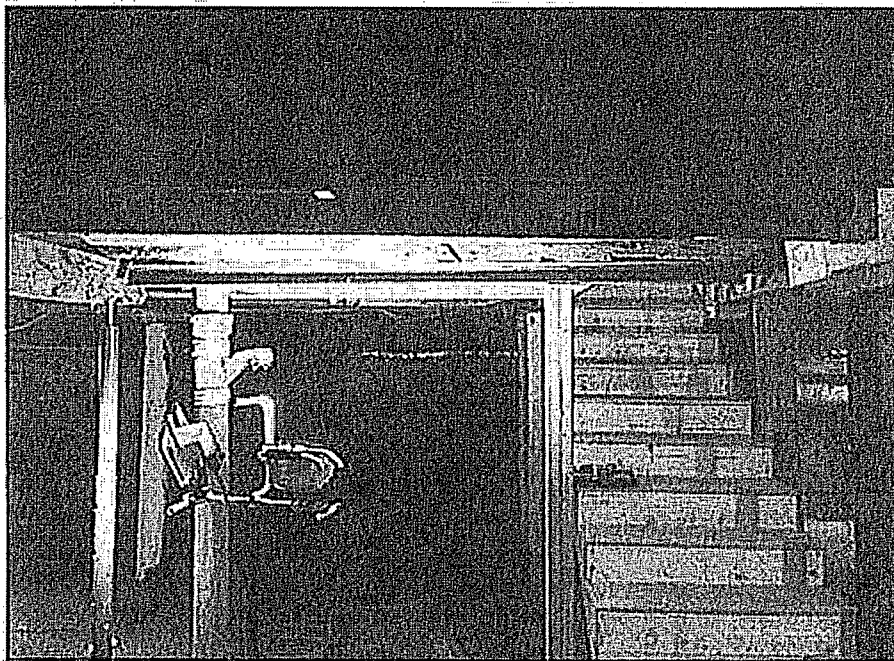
Steel W-beam possibly shoring existing support beam; shoring unstable as installed.
